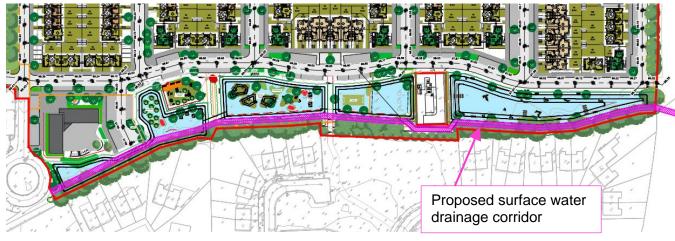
Proposed Indicative Route for Future SW Drainage Corridor (extract from drawing SHB5-CGK-DR-MOR-CS-P3-702)
